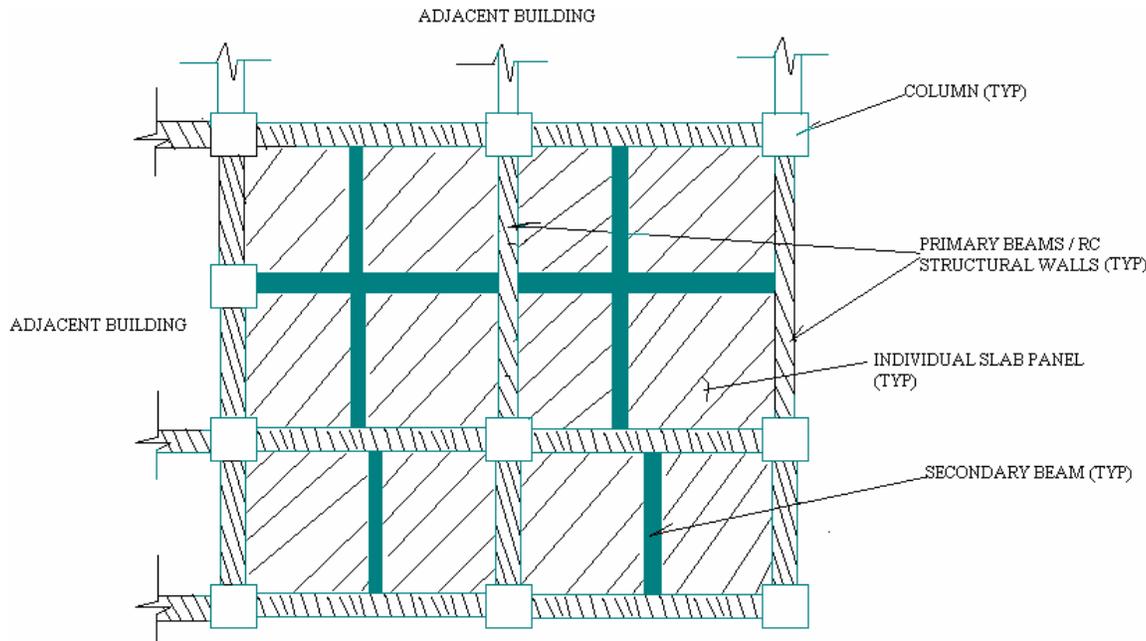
Layout of a Typical Sub model of Floor, Indicating Primary and Secondary Beams, Slab Panels, Shear Walls and Columns
